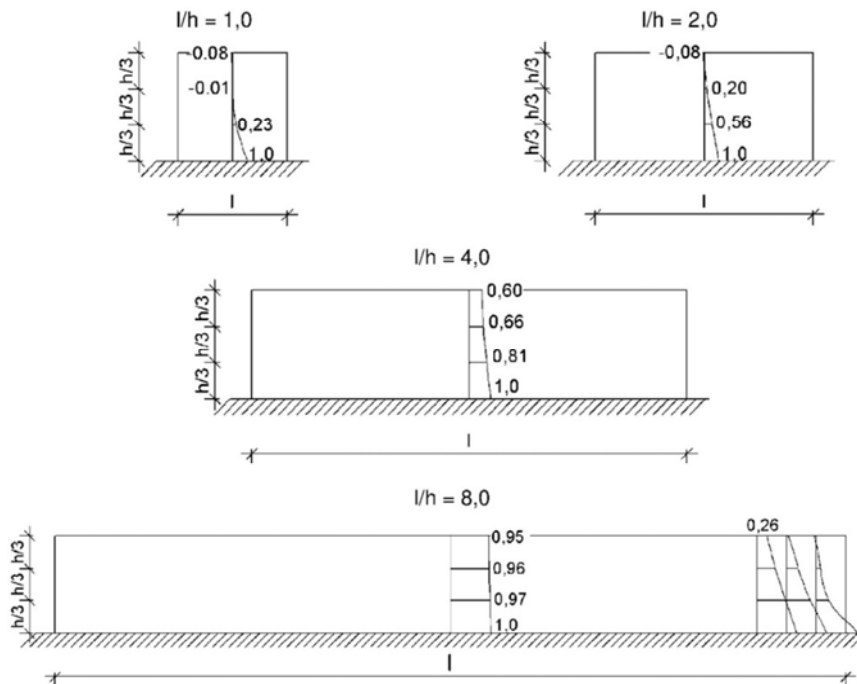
Stress distribution for base wall restraint at $l/2$ dependent on l/h due to cooling of the wall.
